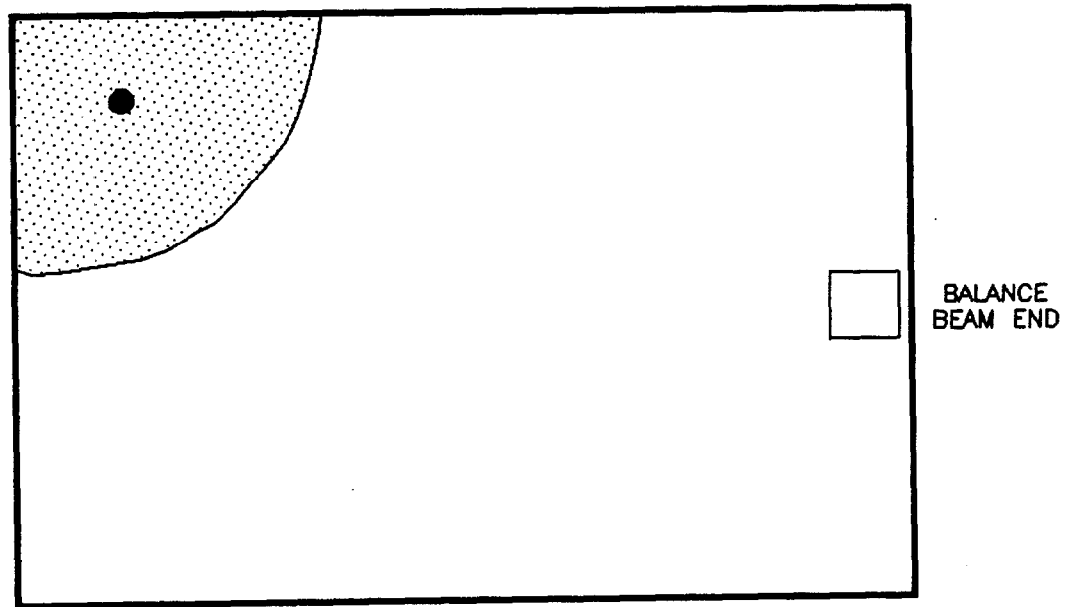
Building 25, Mezzanine, Northwest Corner of the North Wall – Measurement Locations
